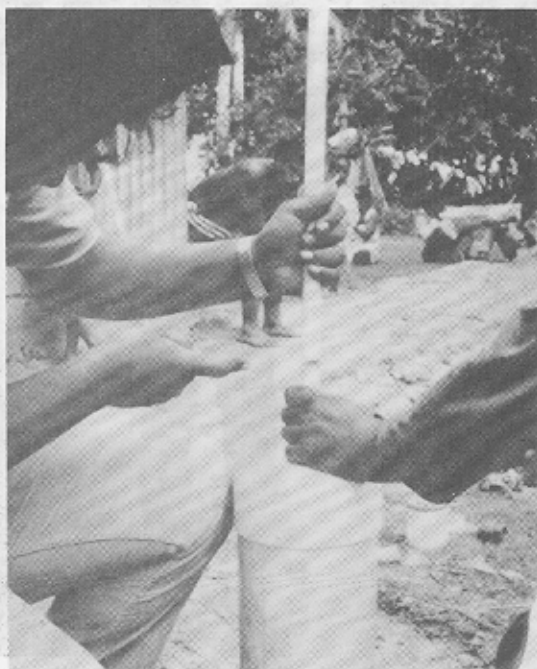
Installing the union/elbow assembly. Use PVC glue to attach the elbow end of the assembly to the well pipe. (Note: before gluing, rough edges of the pipe end should be removed with a knife and the end of the pipe should be sanded lightly). After gluing, the elbow will rest on the well cap keeping the pump 6 inches from the aggregate at the bottom of the well.
